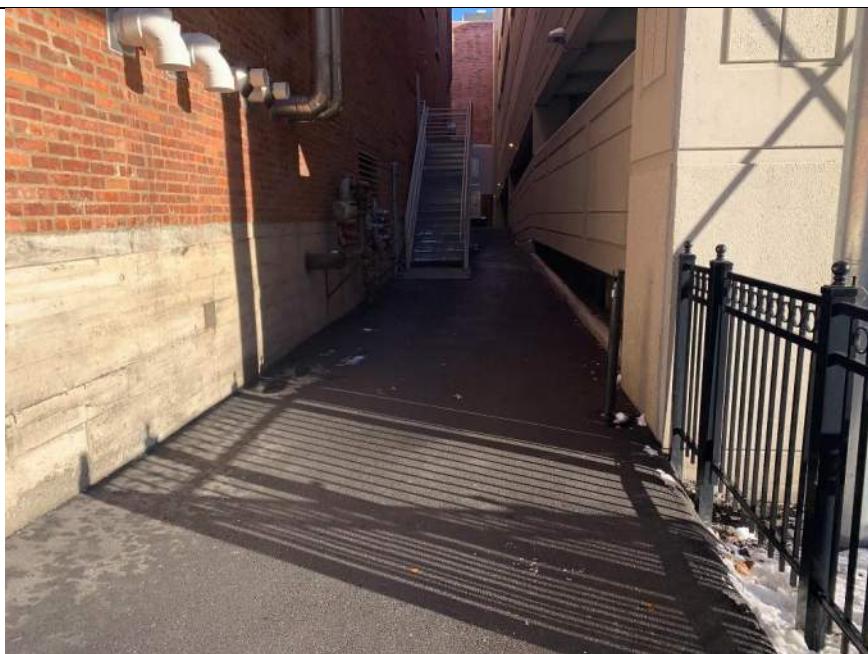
Looking northeast (from Howard Street); paved surface cover in alley between 144 State Street (to the left) and parking garage (to the right) (12/14/22).
